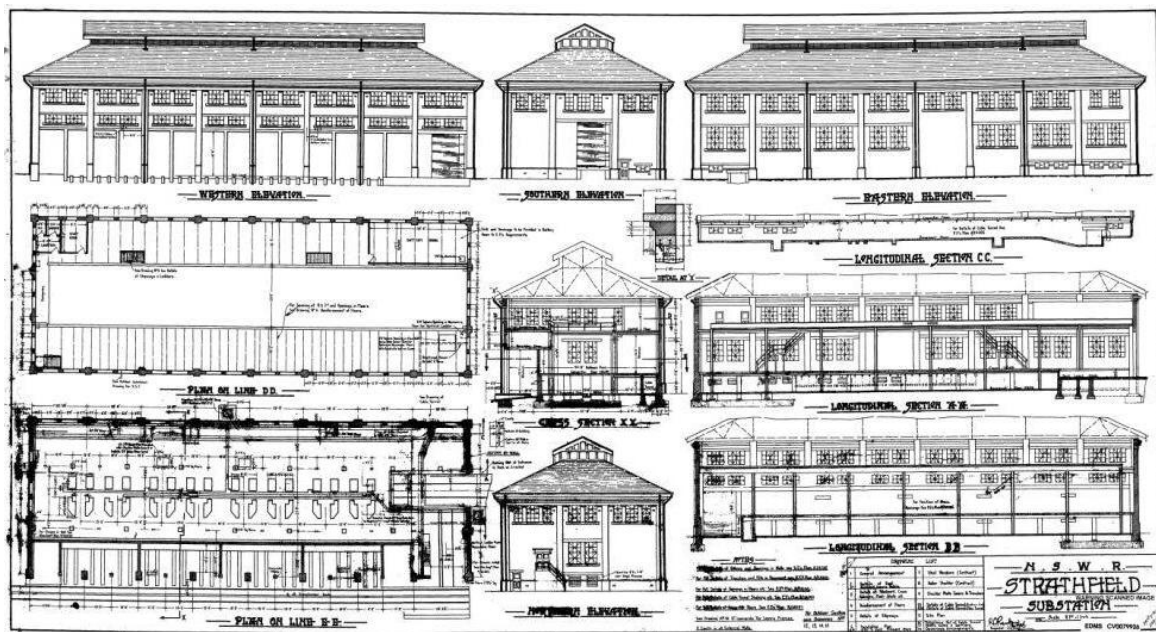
Plans for the Strathfield Substation, 1927. (RailCorp Plan, Ref: 0079926)
